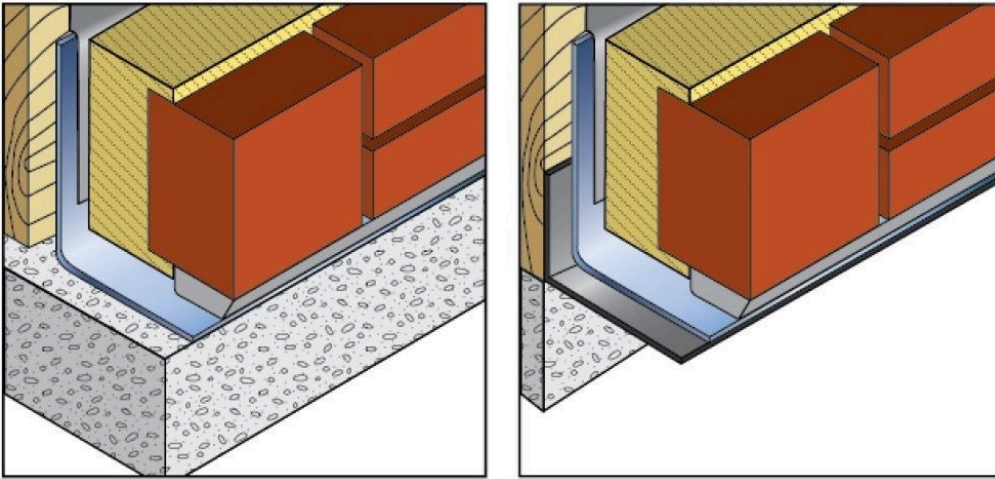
SureTouch support with brick ledge and SureTouch support using a steel starter strip
